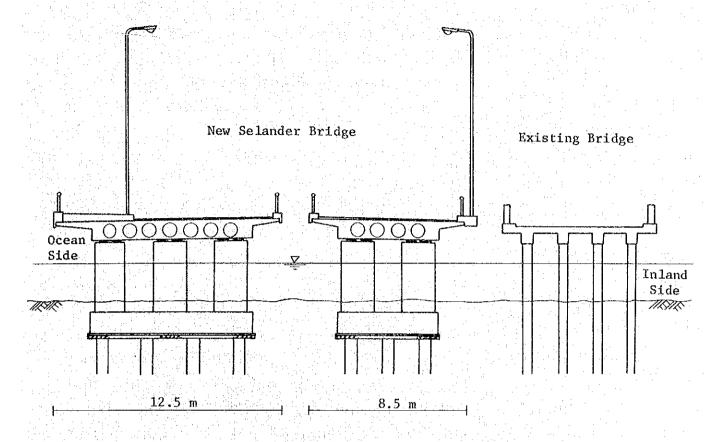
Cross Sectional View of Planned and Existing Selander Bridge
